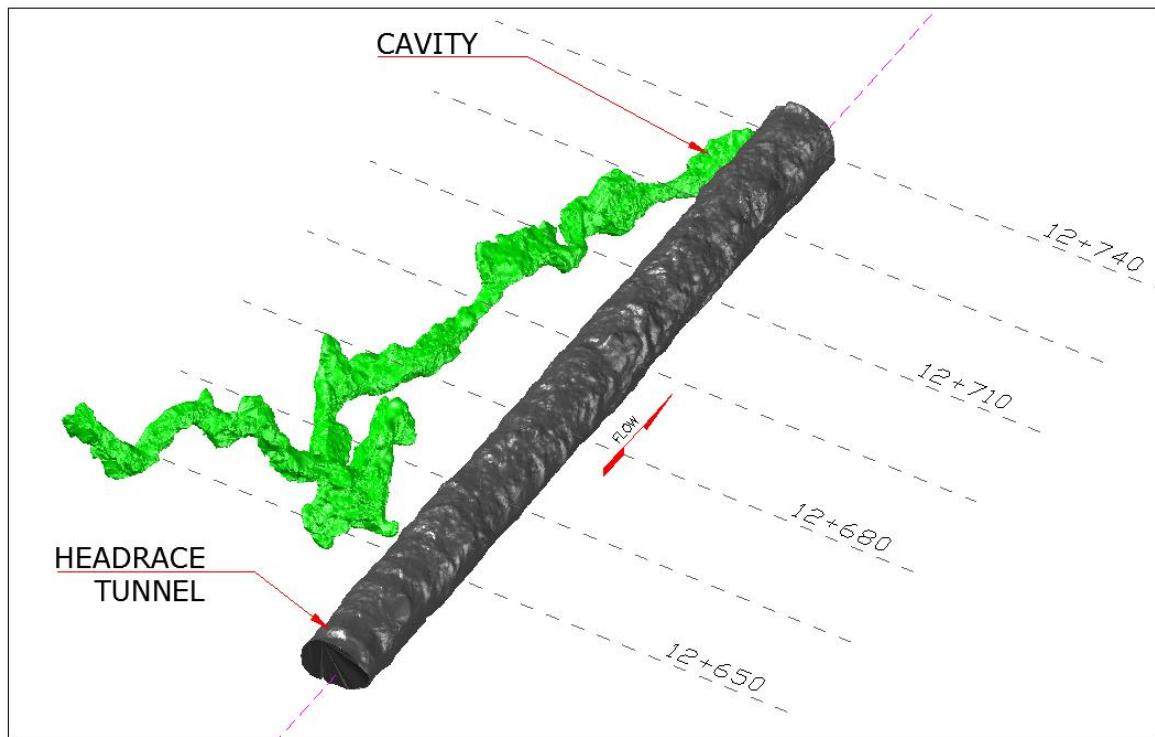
Isometric side view of the El Hoyo de la Beba cavity
